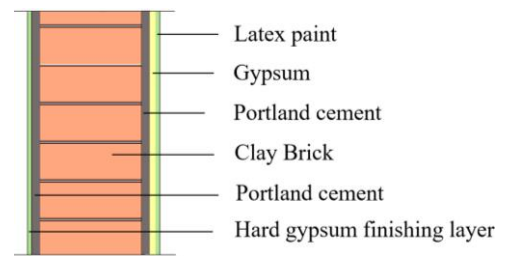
Section in wall construction which isn't use thermal insulation. The wall U-value is 0.444 W/m<sup>2</sup>°C.
